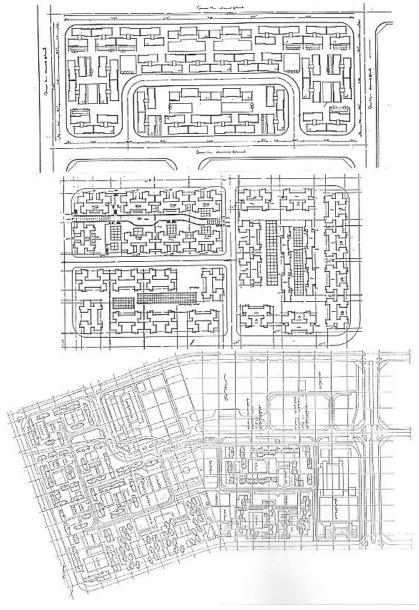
Typical Walk-ups' site plans; Settlement No.3, at Khatamiya [14.a &14.b] and New Ameriyah City [13], Egypt.
